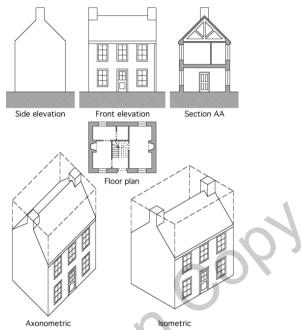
Standard views (views) that are used in design drawings and construction drawings.
